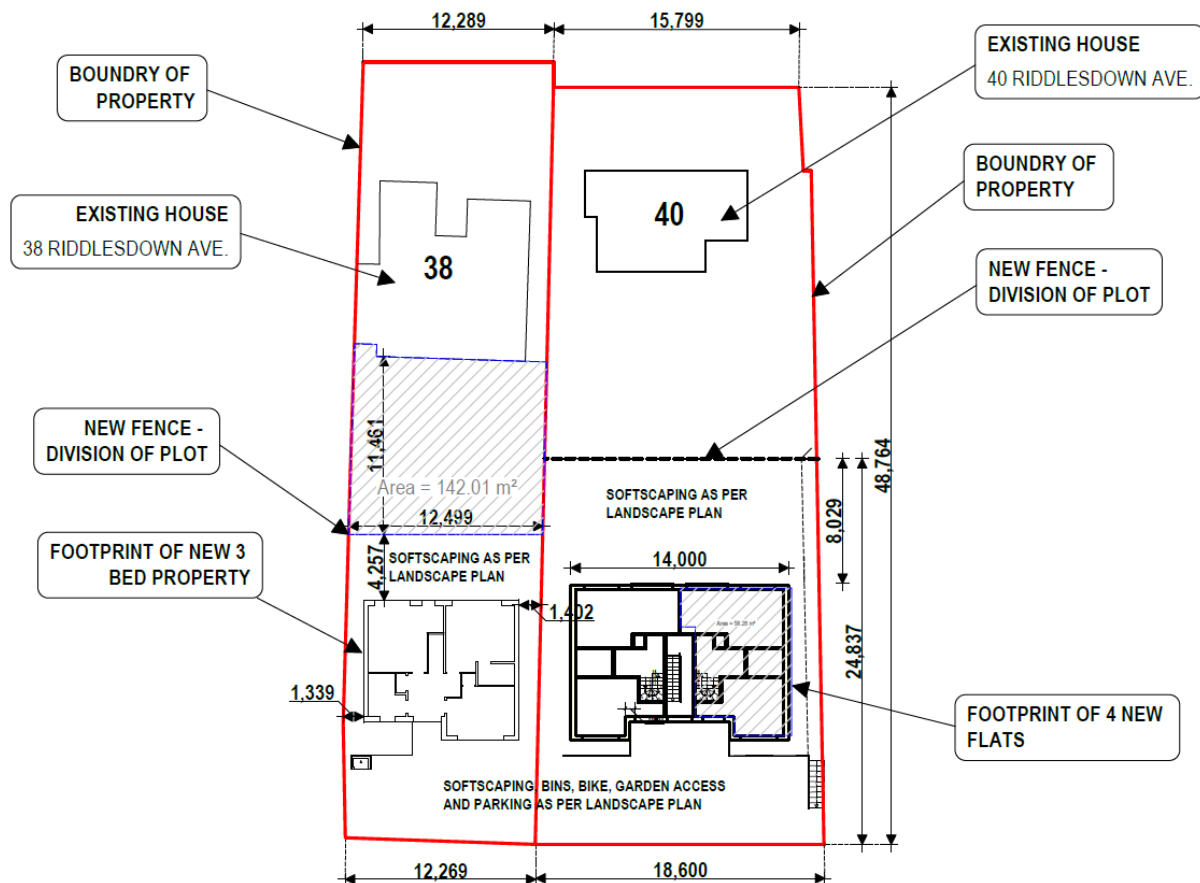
Proposed site plan showing proposal in relation to neighbouring properties (003 Rev M)
